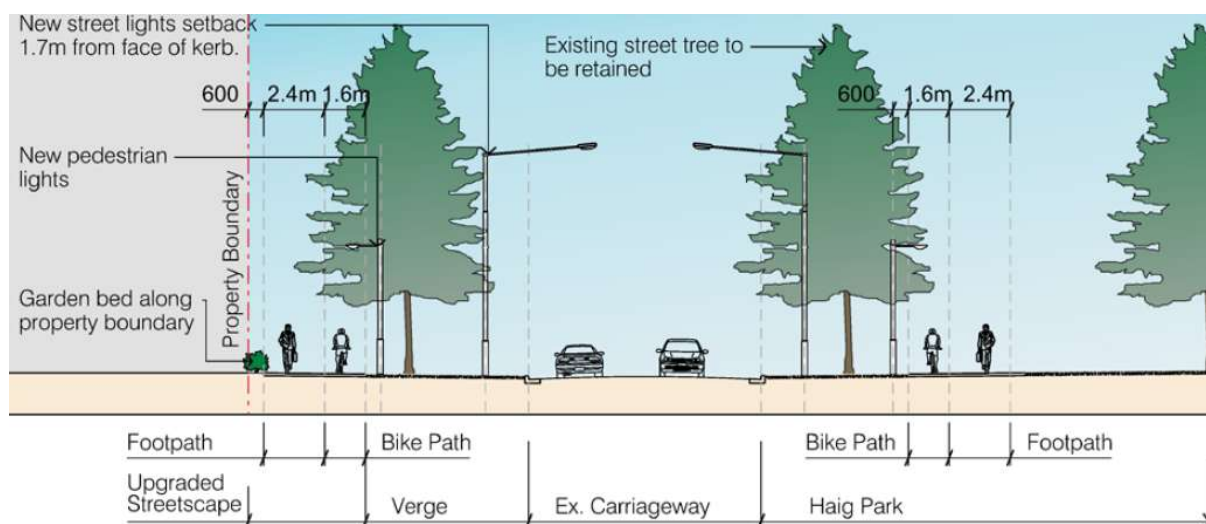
Girrahween Street Section (Braddon Mixed Use Area Guidelines)
